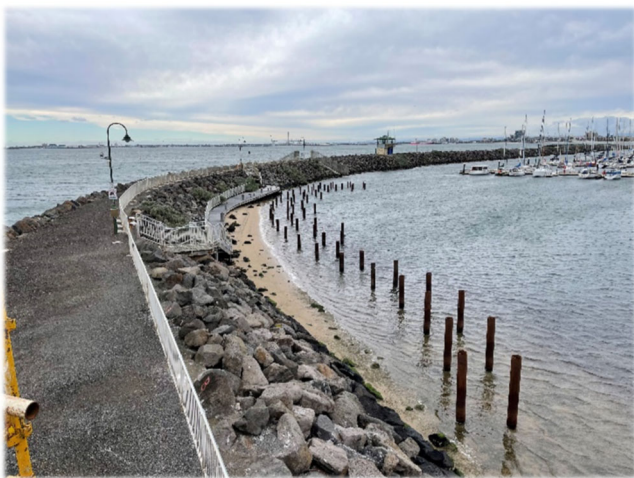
Piles have been installed for the new penguin viewing boardwalk (August 2022)
